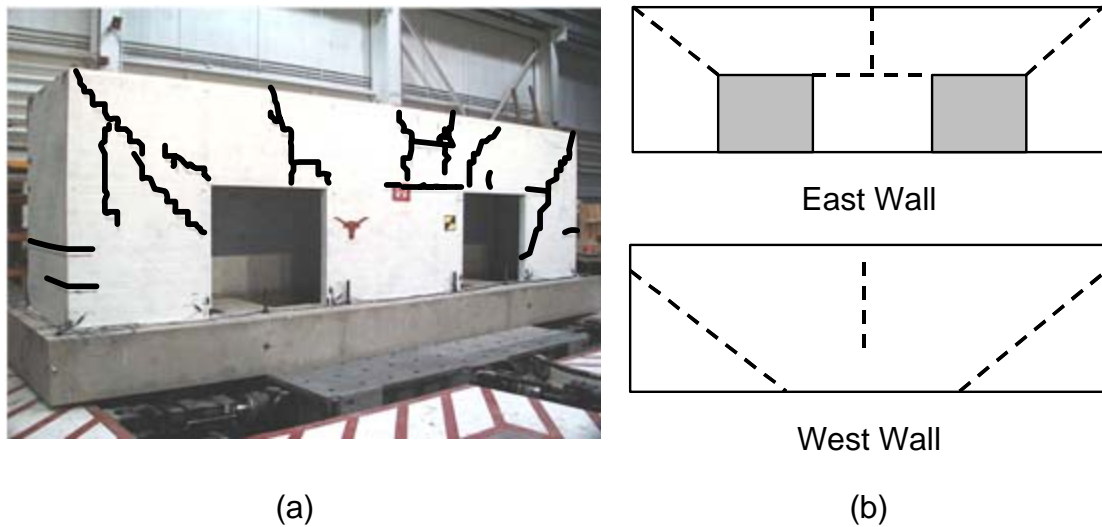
Damage to east and west walls from E-W shaking: (a) Photograph and (b) Idealized crack patterns of east and west walls (Cohen 2001).
